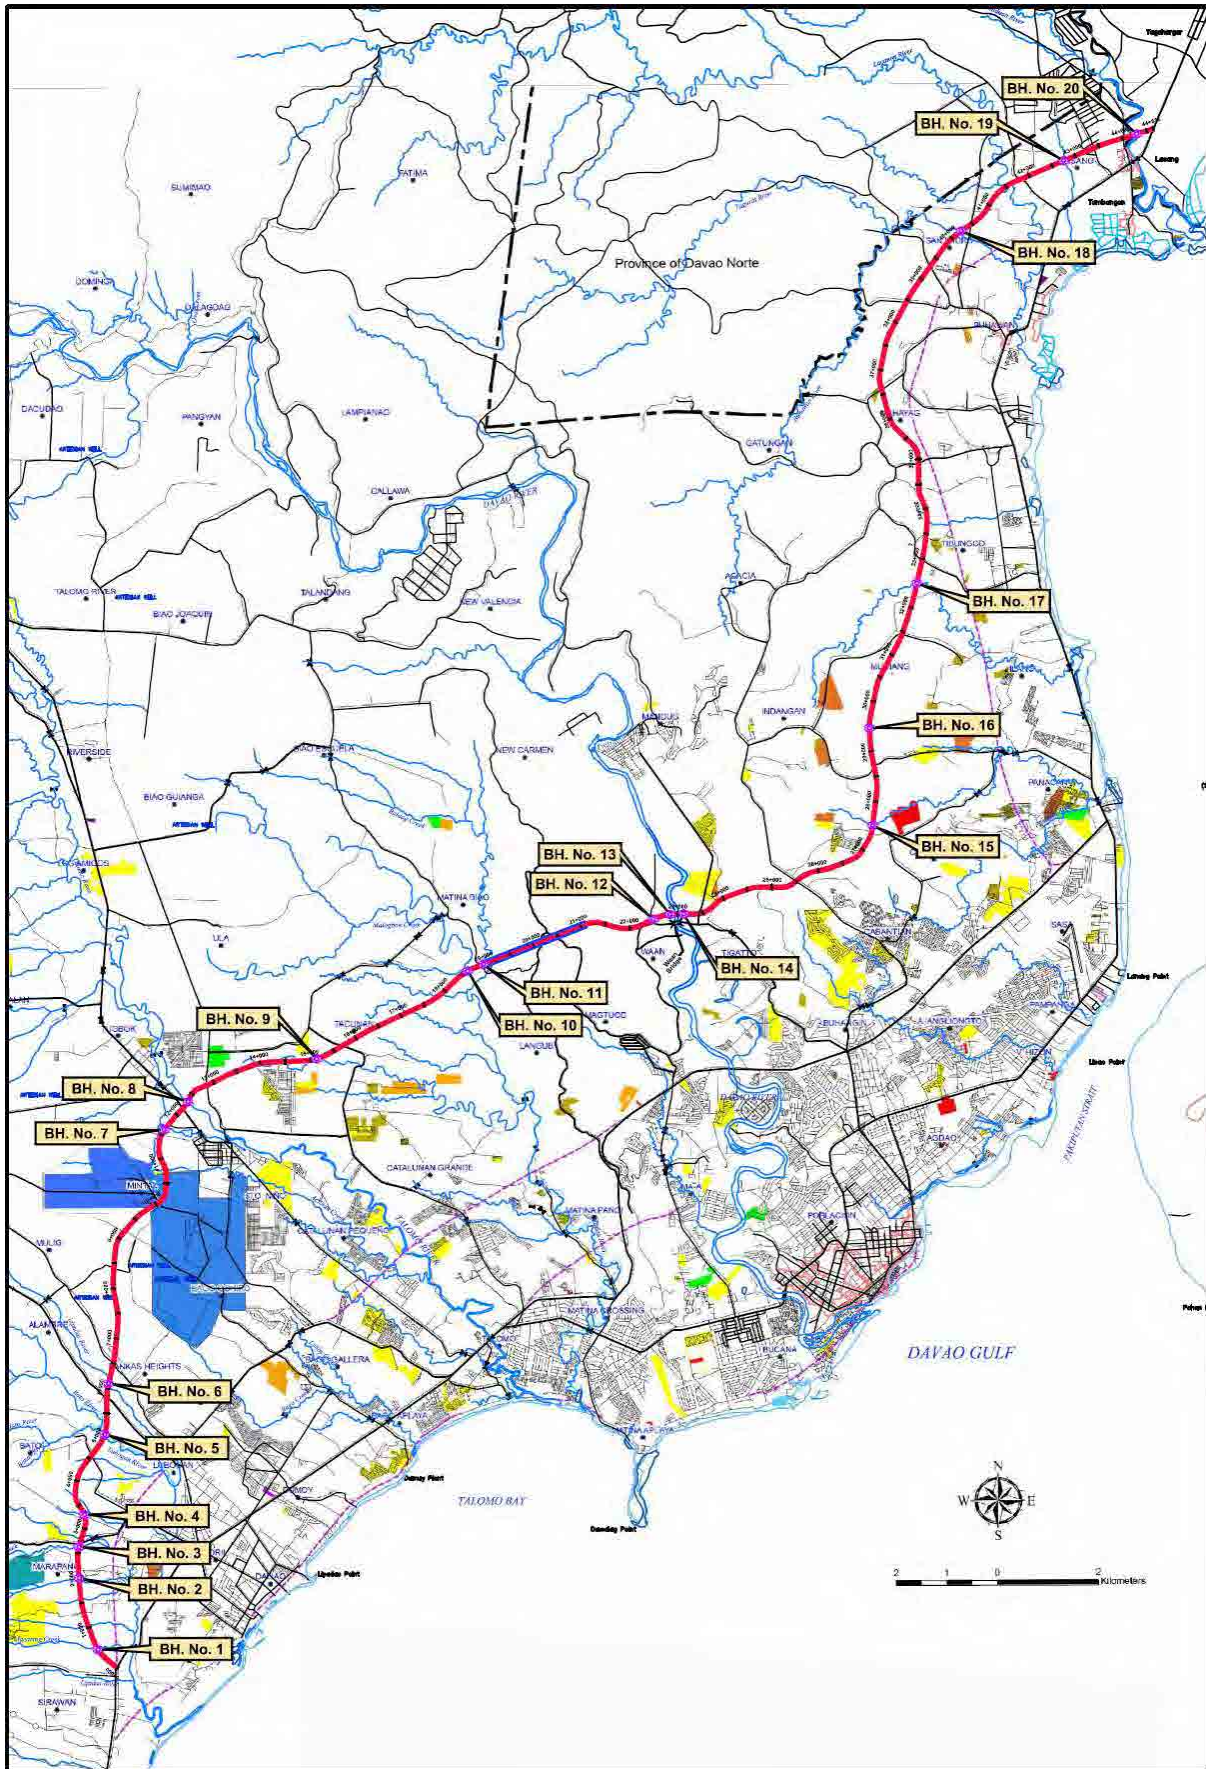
BRIDGE SITE BORING LOCATION MAP
